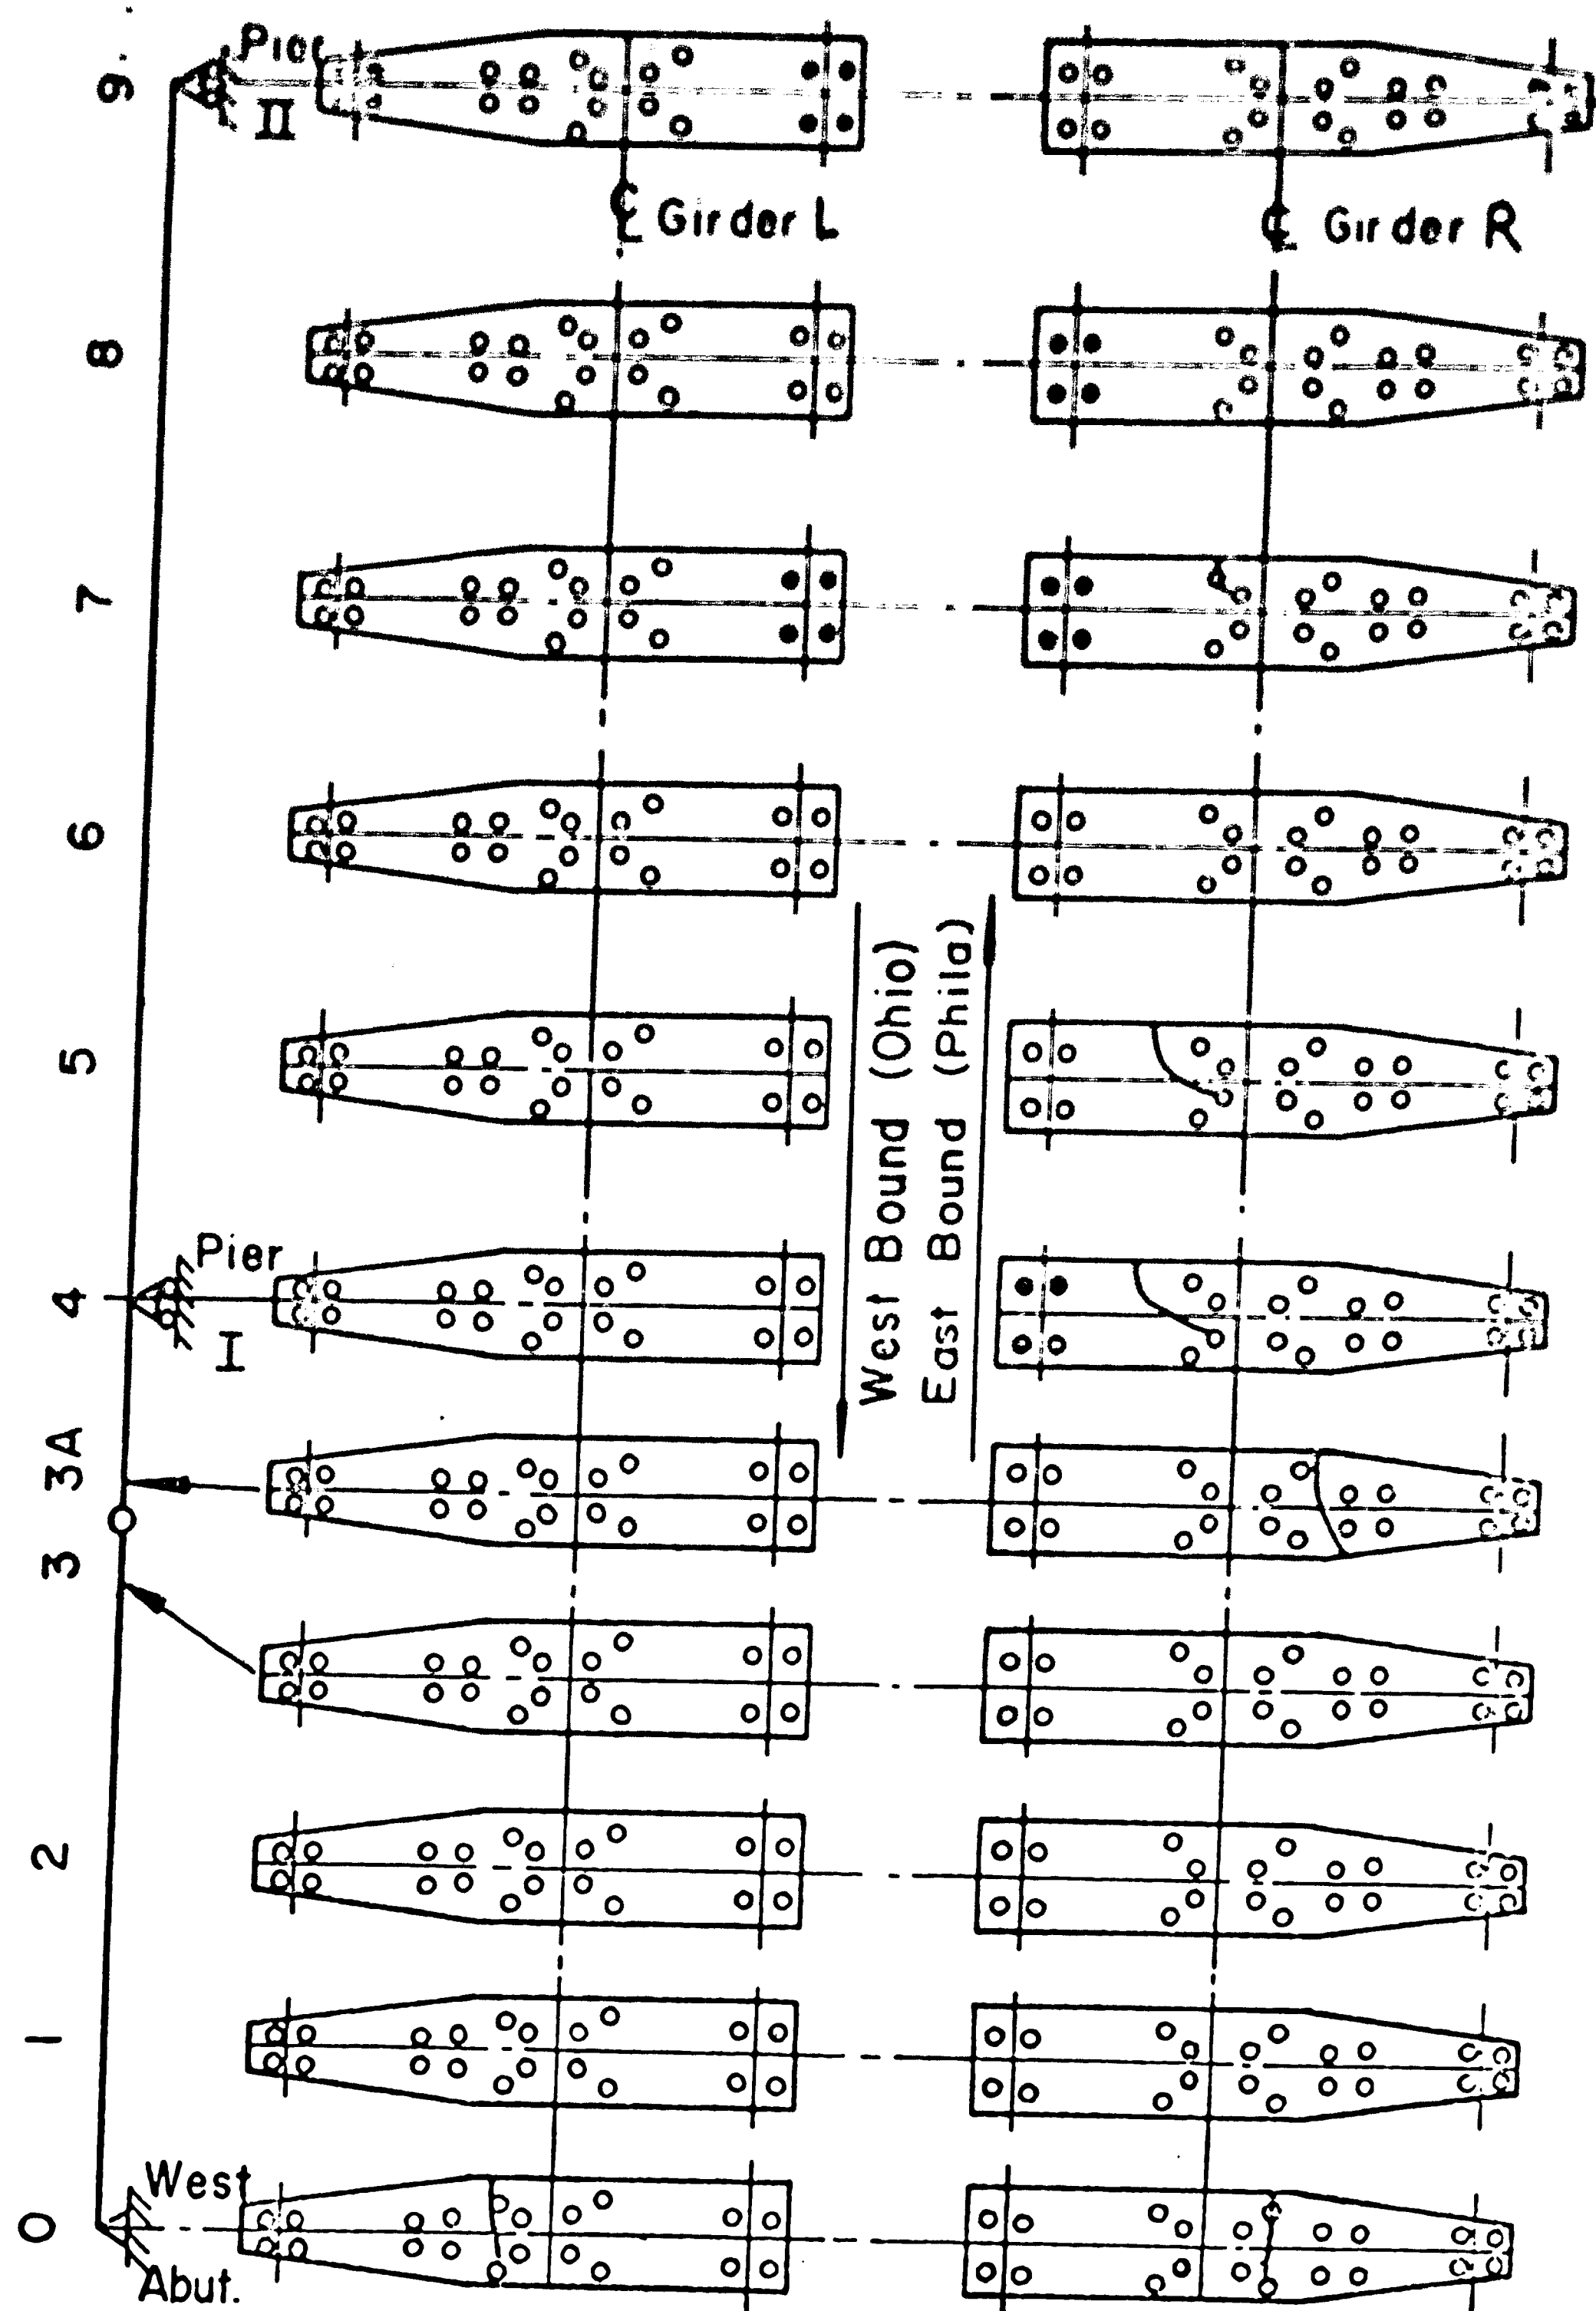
Schematic of Cracks and Loose Rivets in Tie-Plates of Test Span
